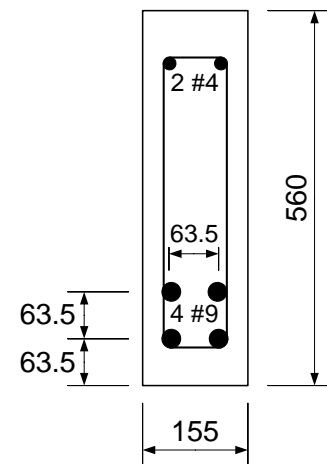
C-2 beam cross-section [10] (all dimension in mm)
